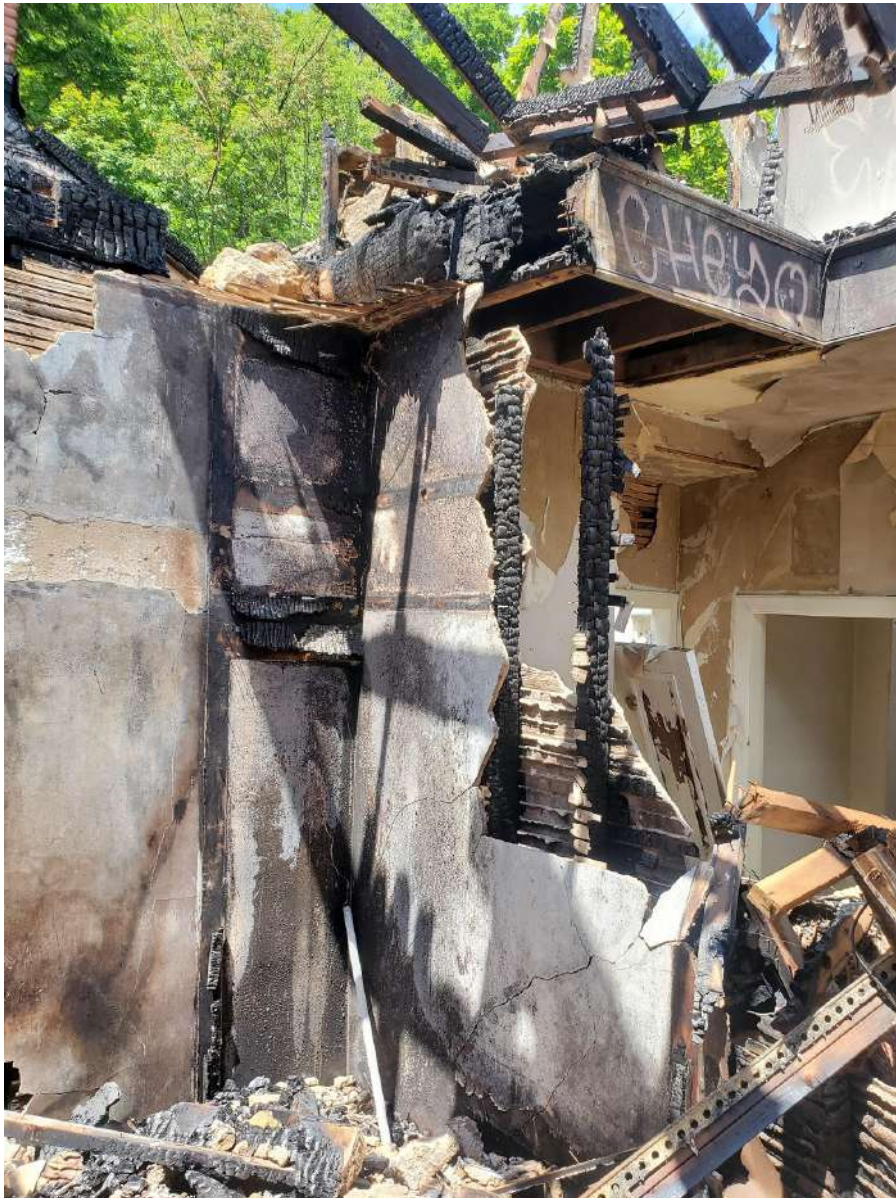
Typical Condition of 2<sup>nd</sup> Floor and Roof Structure and Exterior Walls on South 2/3 of Building
